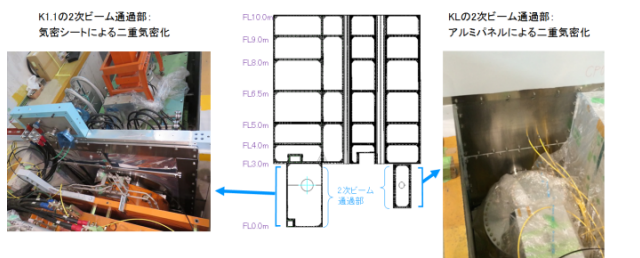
The airtight wall between FL0m and FL3m in K1.1-KL beamline.
